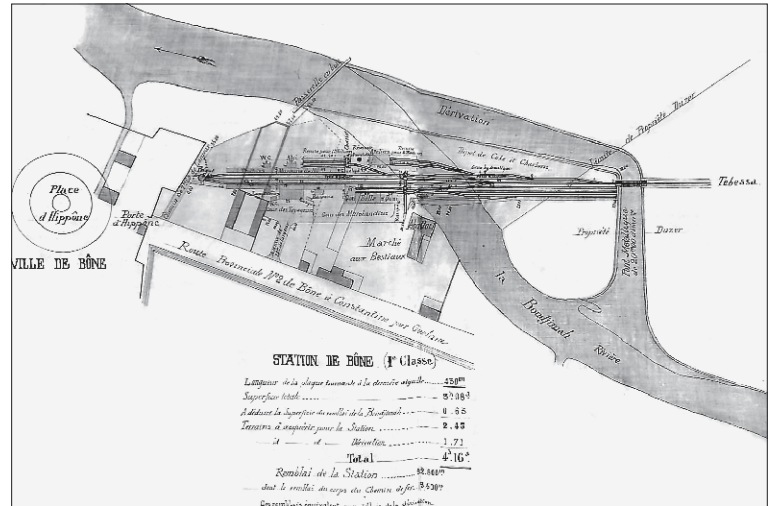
MASTER PLAN OF BÔNE-GUELMA RAILWAY STATION
